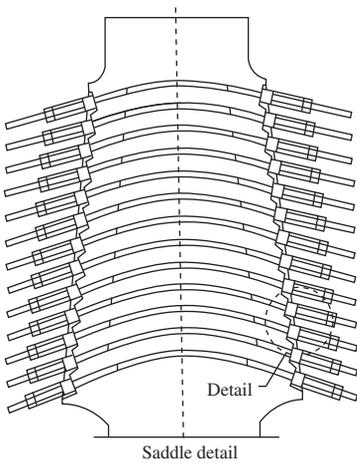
Vidin–Calafat Bridge<sup>21</sup>
